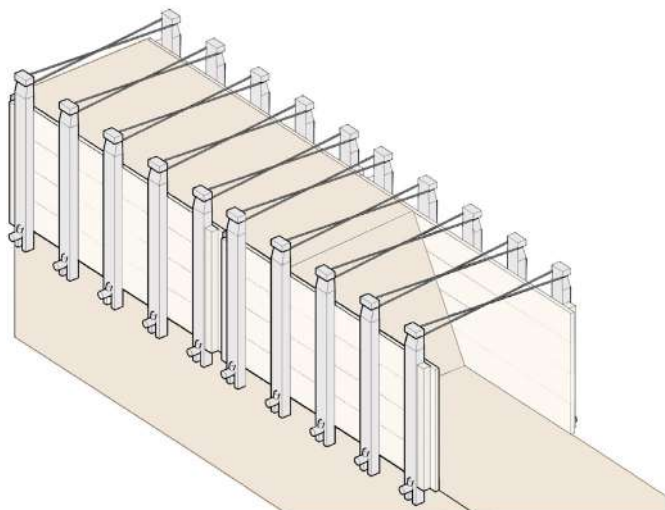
Schema of the formwork used in Bofilla Tower (C. Mileto and F. Vegas).
